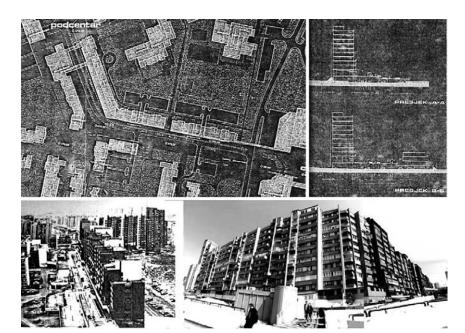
Kičma - original design of the complex structure: plan and cross-sections from 1976, aerial view from 1988, and actual view of row of high buildings.
